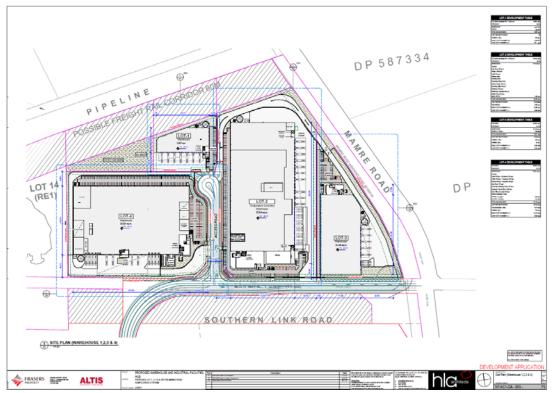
Site Plan (Warehouse 1,2,3 & 4 Dwg no. SP-KC1-DA-003-P3)
